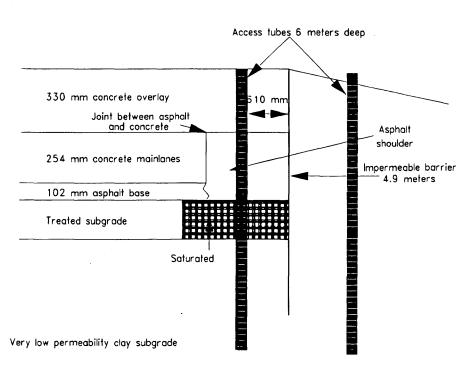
Cross section of I-45 near Palmer after concrete overlay.
